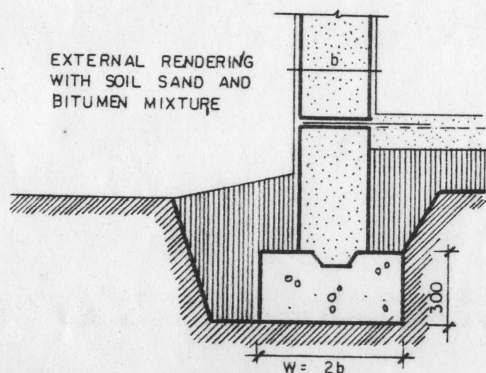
Concrete strip foundation suitable for attackpame, wattle and daub, sun-dried brick, or adobe walls in heavy rainfall areas (after ref 11)
